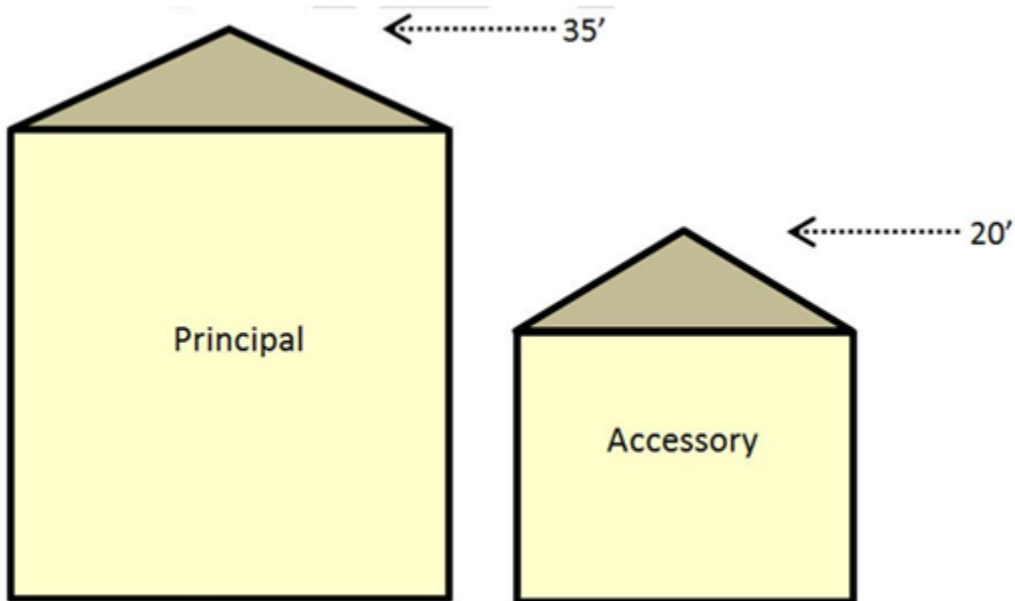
Typical RR-2 Zoning District Building Height Example (Abutting Lots Not Developed) (Not Drawn to Scale)
